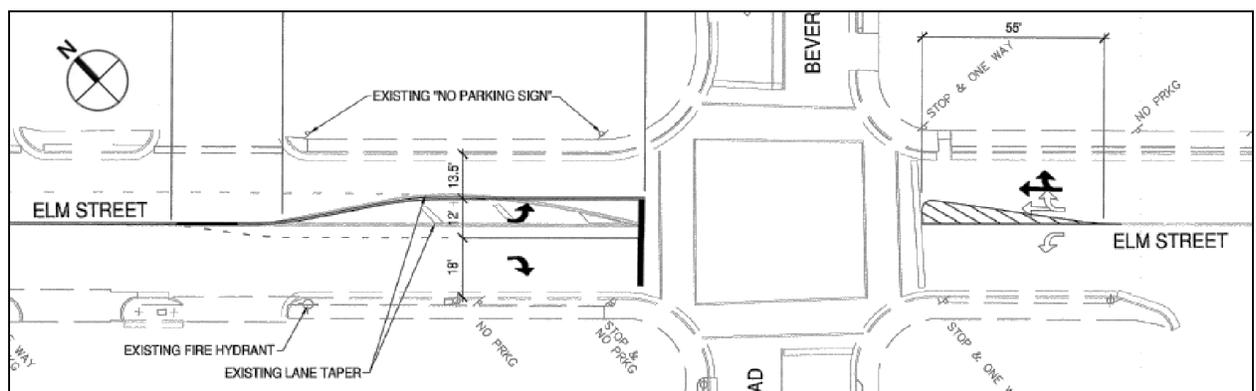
The Beverly Road / Elm Street restriping (Source: Bowman Consulting, June 1, 2014)
